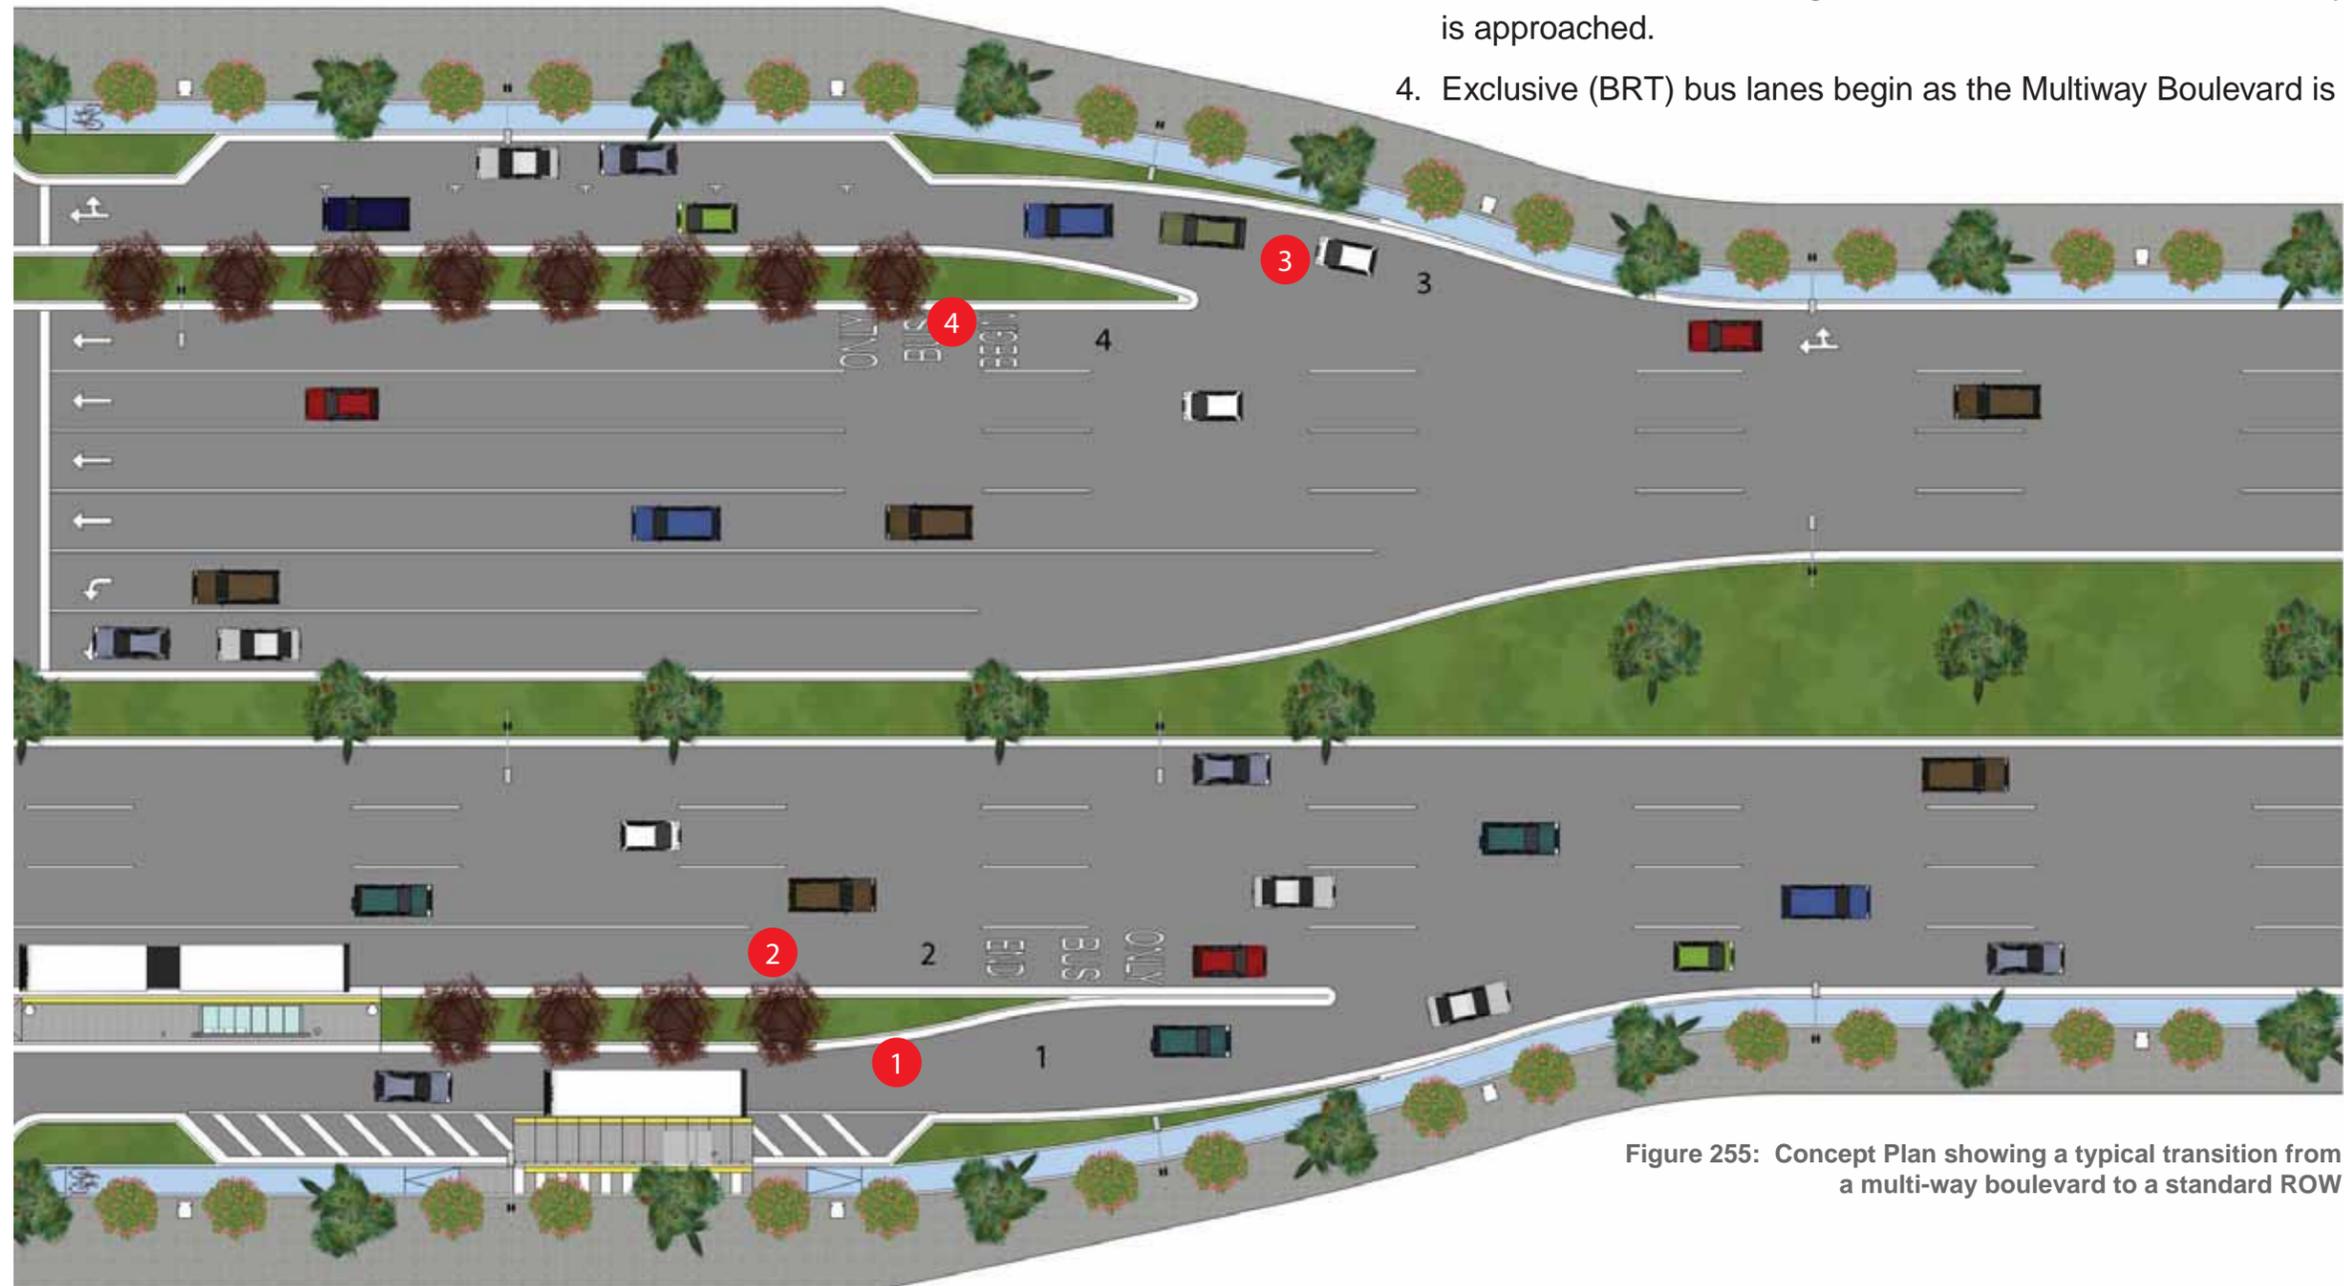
Concept Plan showing a typical transition from a multi-way boulevard to a standard ROW
